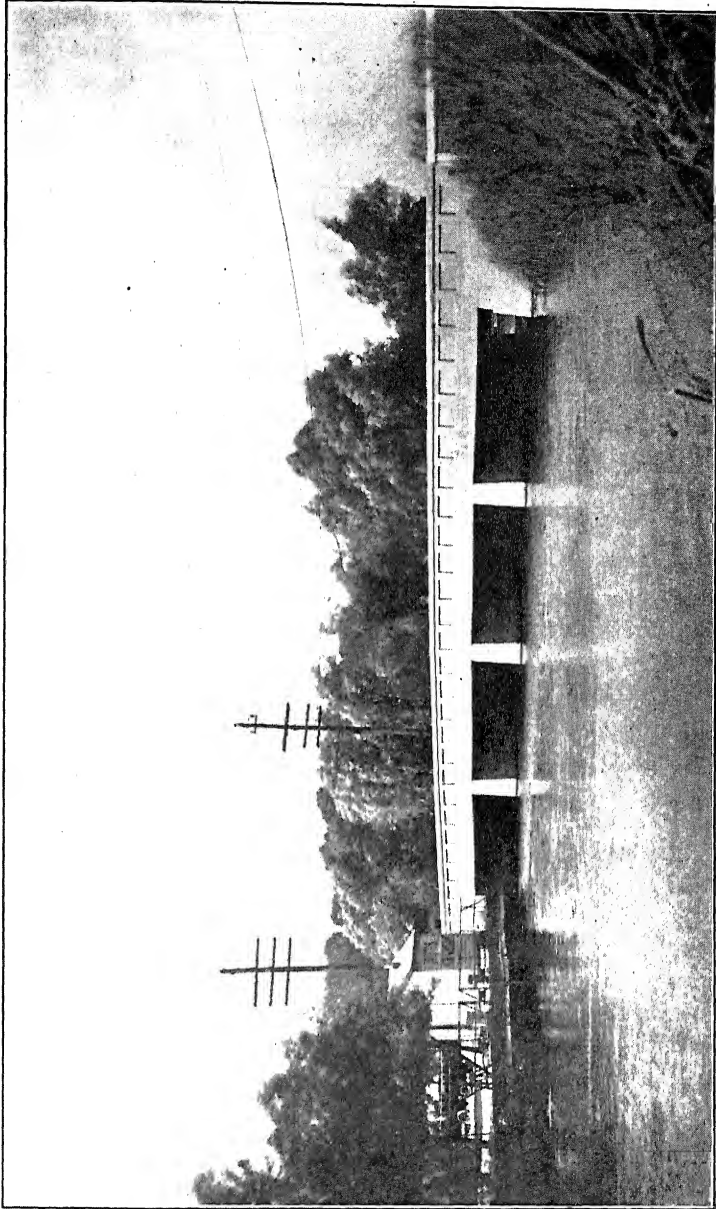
Flat reinforced concrete slab type on pile sub-foundation. Built in 1920. Cost \$20,000. Total span 88 ft. Details of this bridge shown in Fig. 126.
